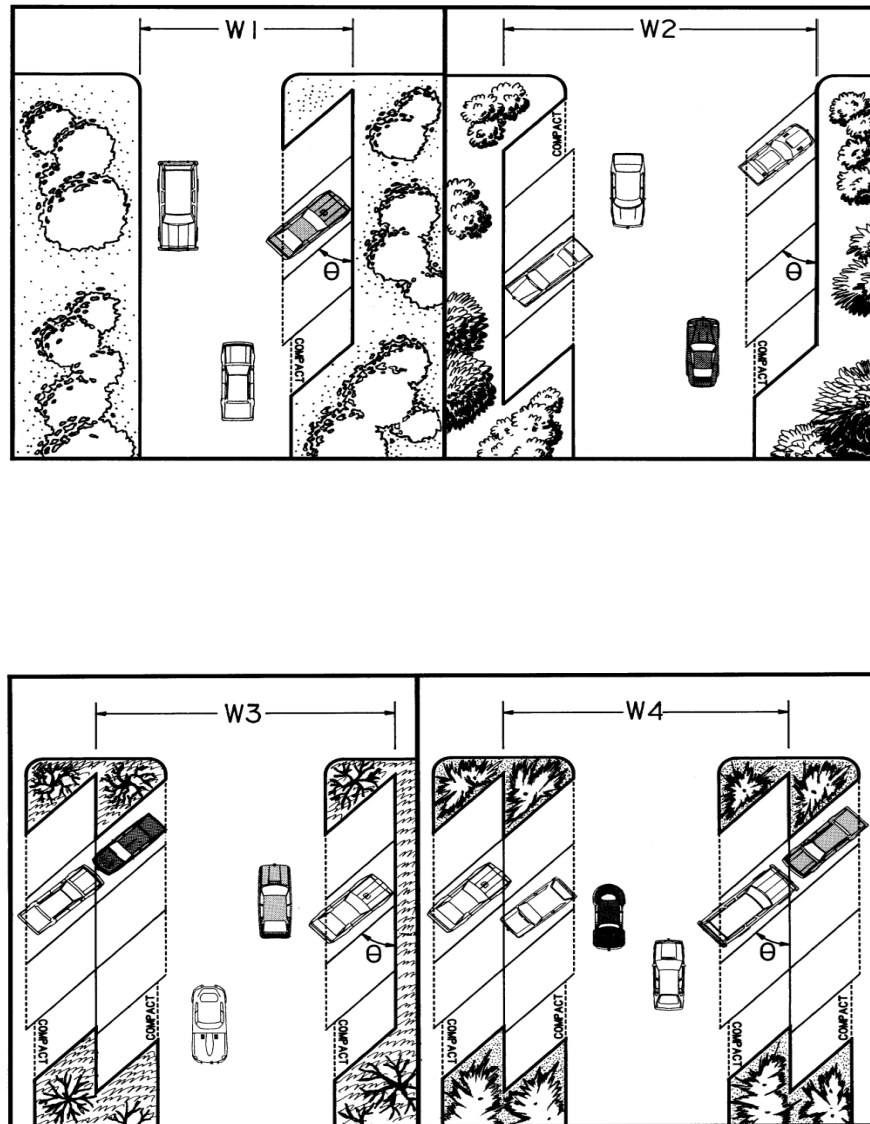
Angle Parking Diagram — Two Way Traffic
